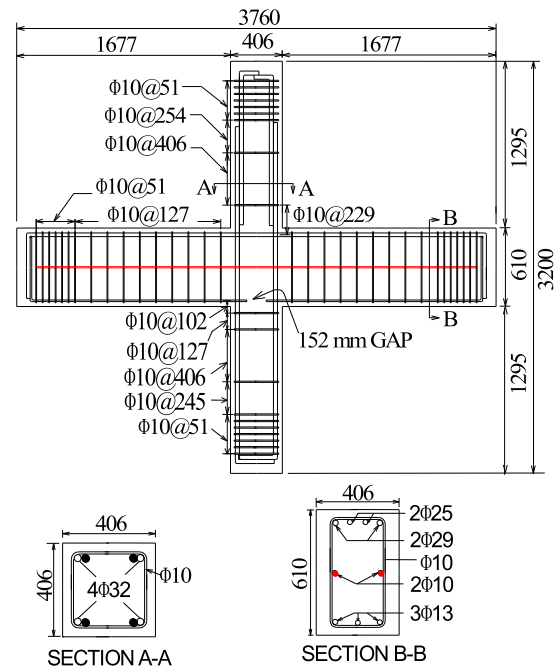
Interior beam-column joint dimensions and steel reinforcement.
